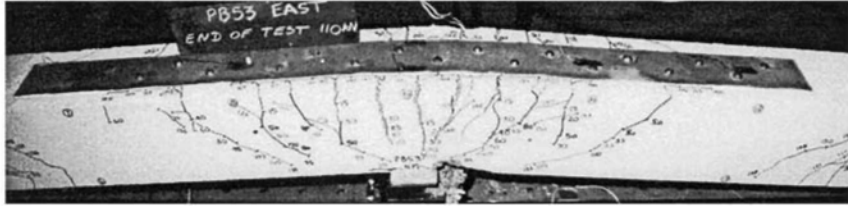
Adhesively-bonded and bolted plated beam at failure
